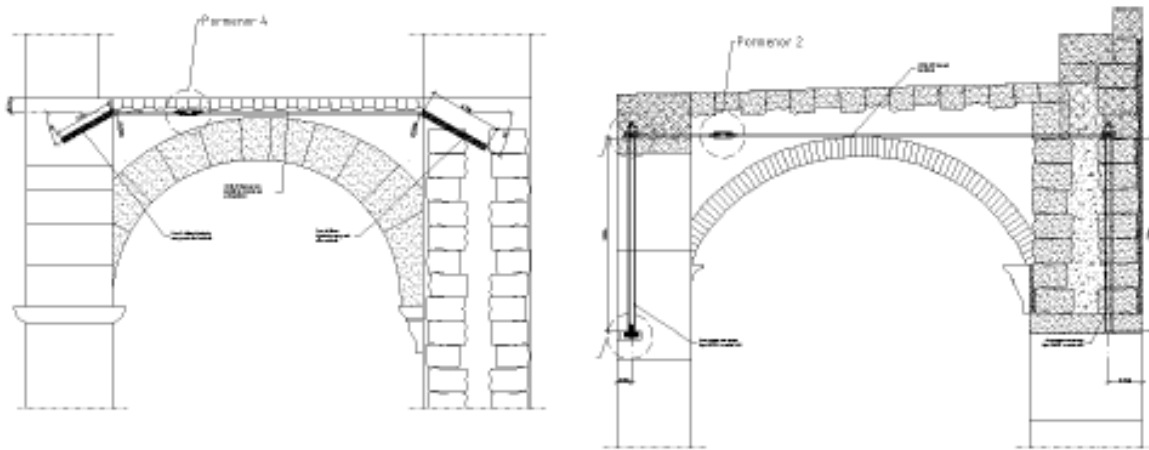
Salzedas' cloister (a) 1st level tying; (b) 2nd level tying and stitching
